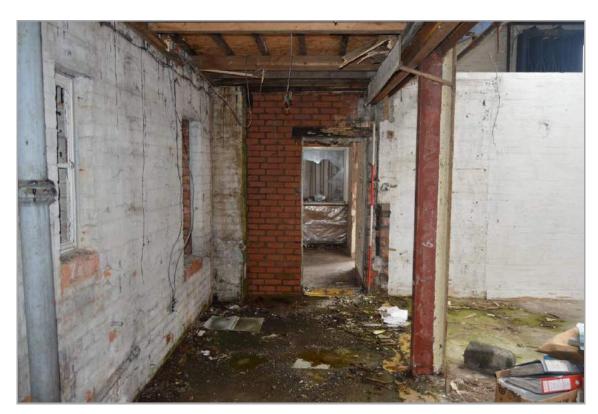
Interior space of linking structure, Building 3 (facing east). Scale 2m.
